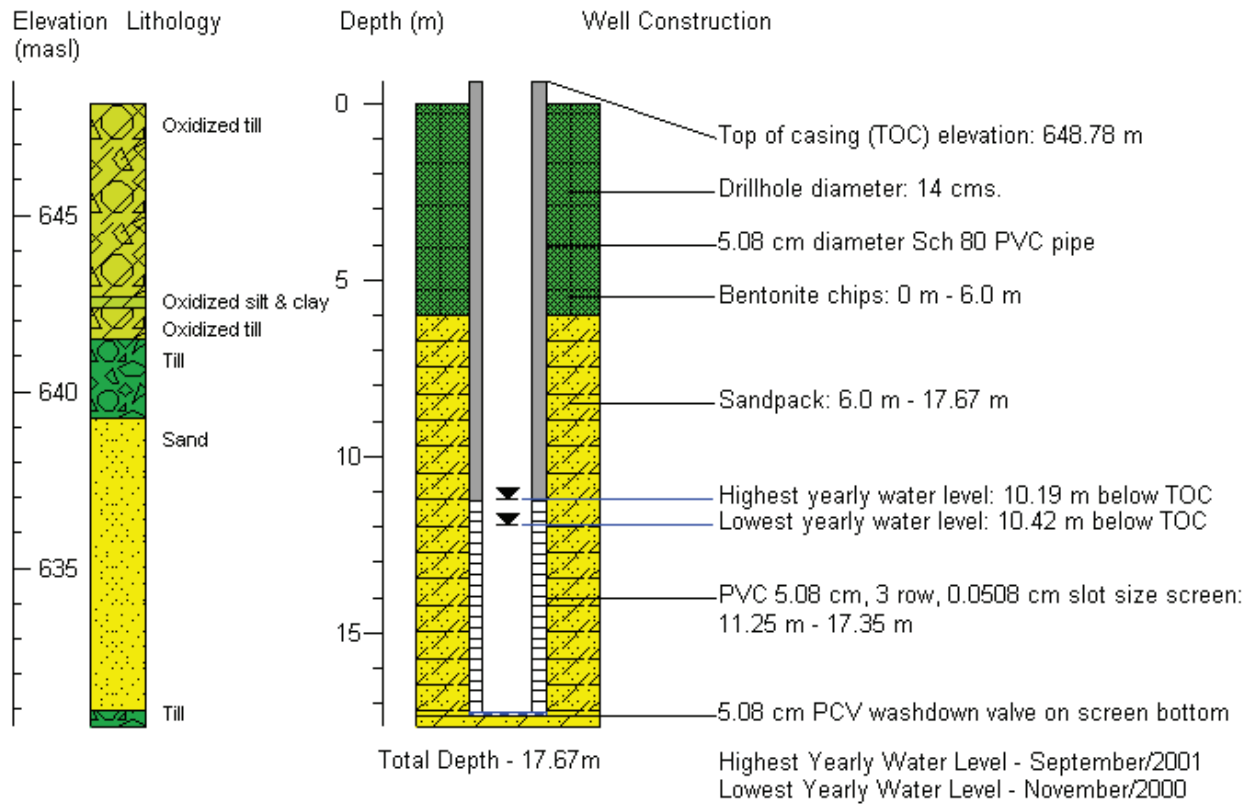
Water-table well construction details: WEPA 00-3-17(WT).
